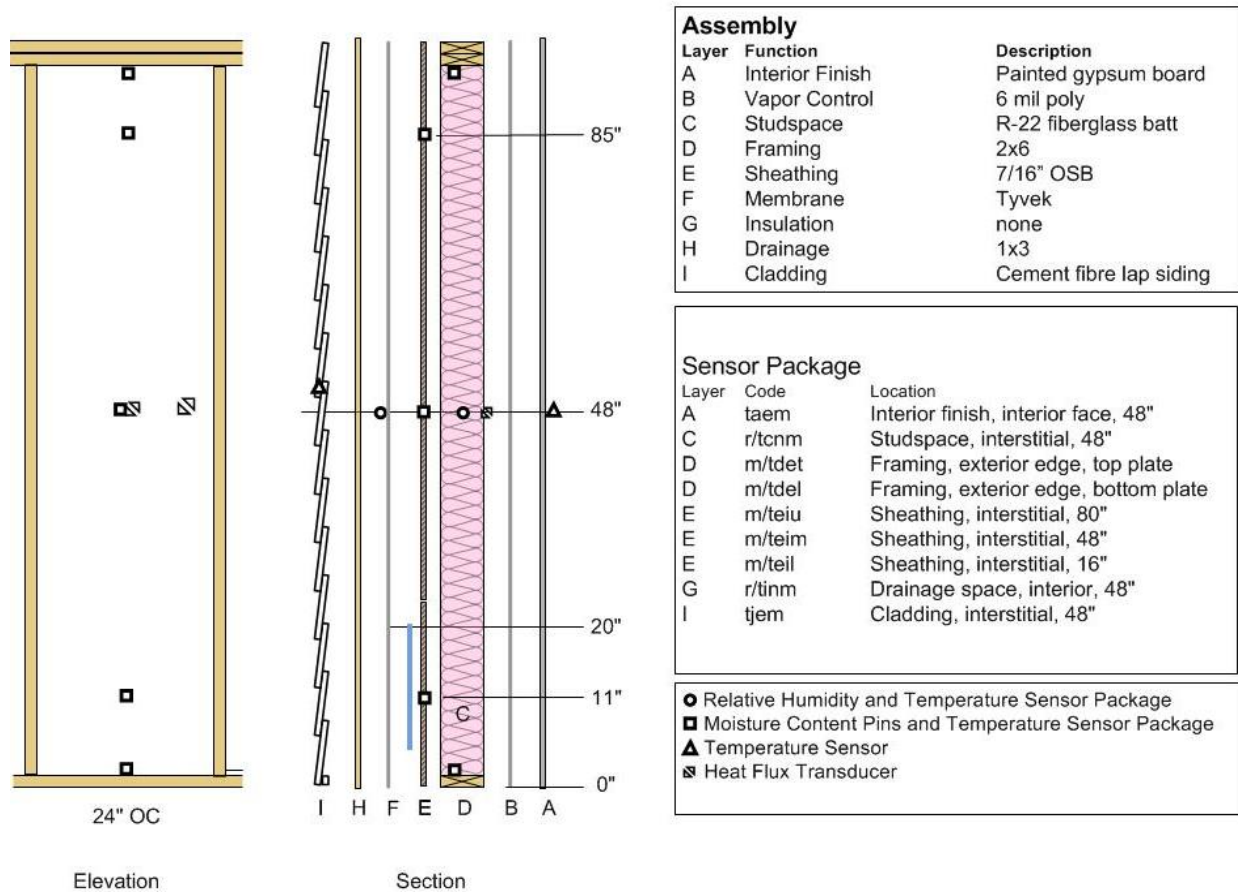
Elevation and exploded vertical cross-section of the center bay of the Datum wall panel
